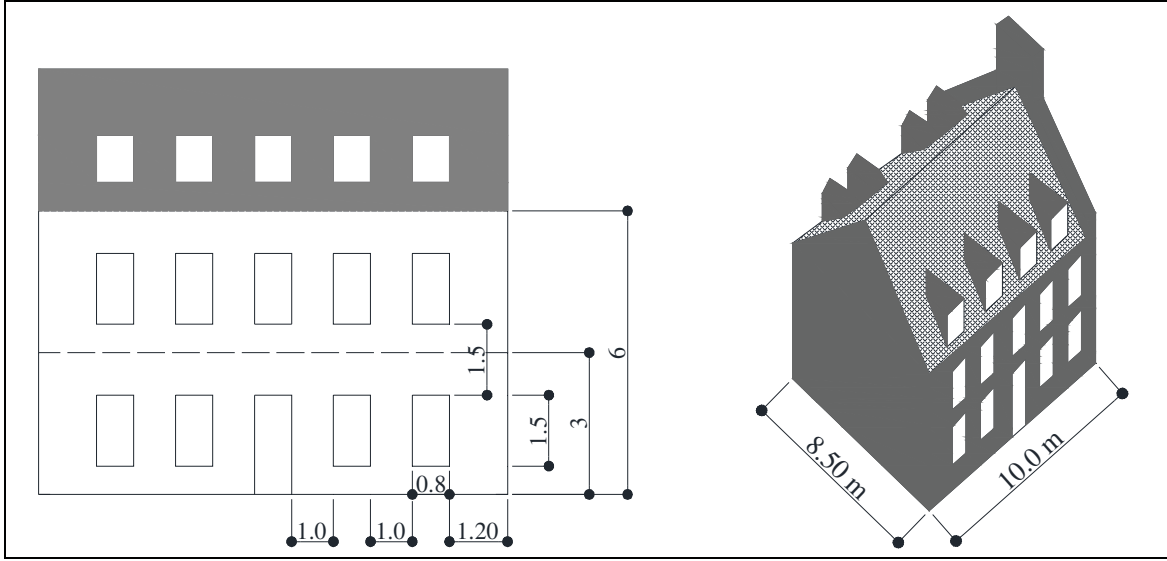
Geometrical parameters of the façade walls of typology-1 two story stone masonry buildings (dimensions are in [m]).
